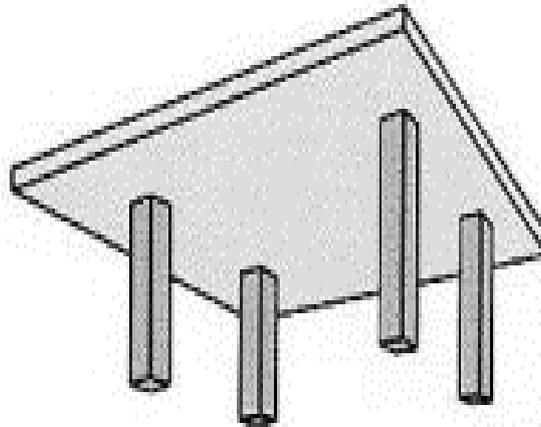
Flat slab (Source: <https://www.concrete.org>)
